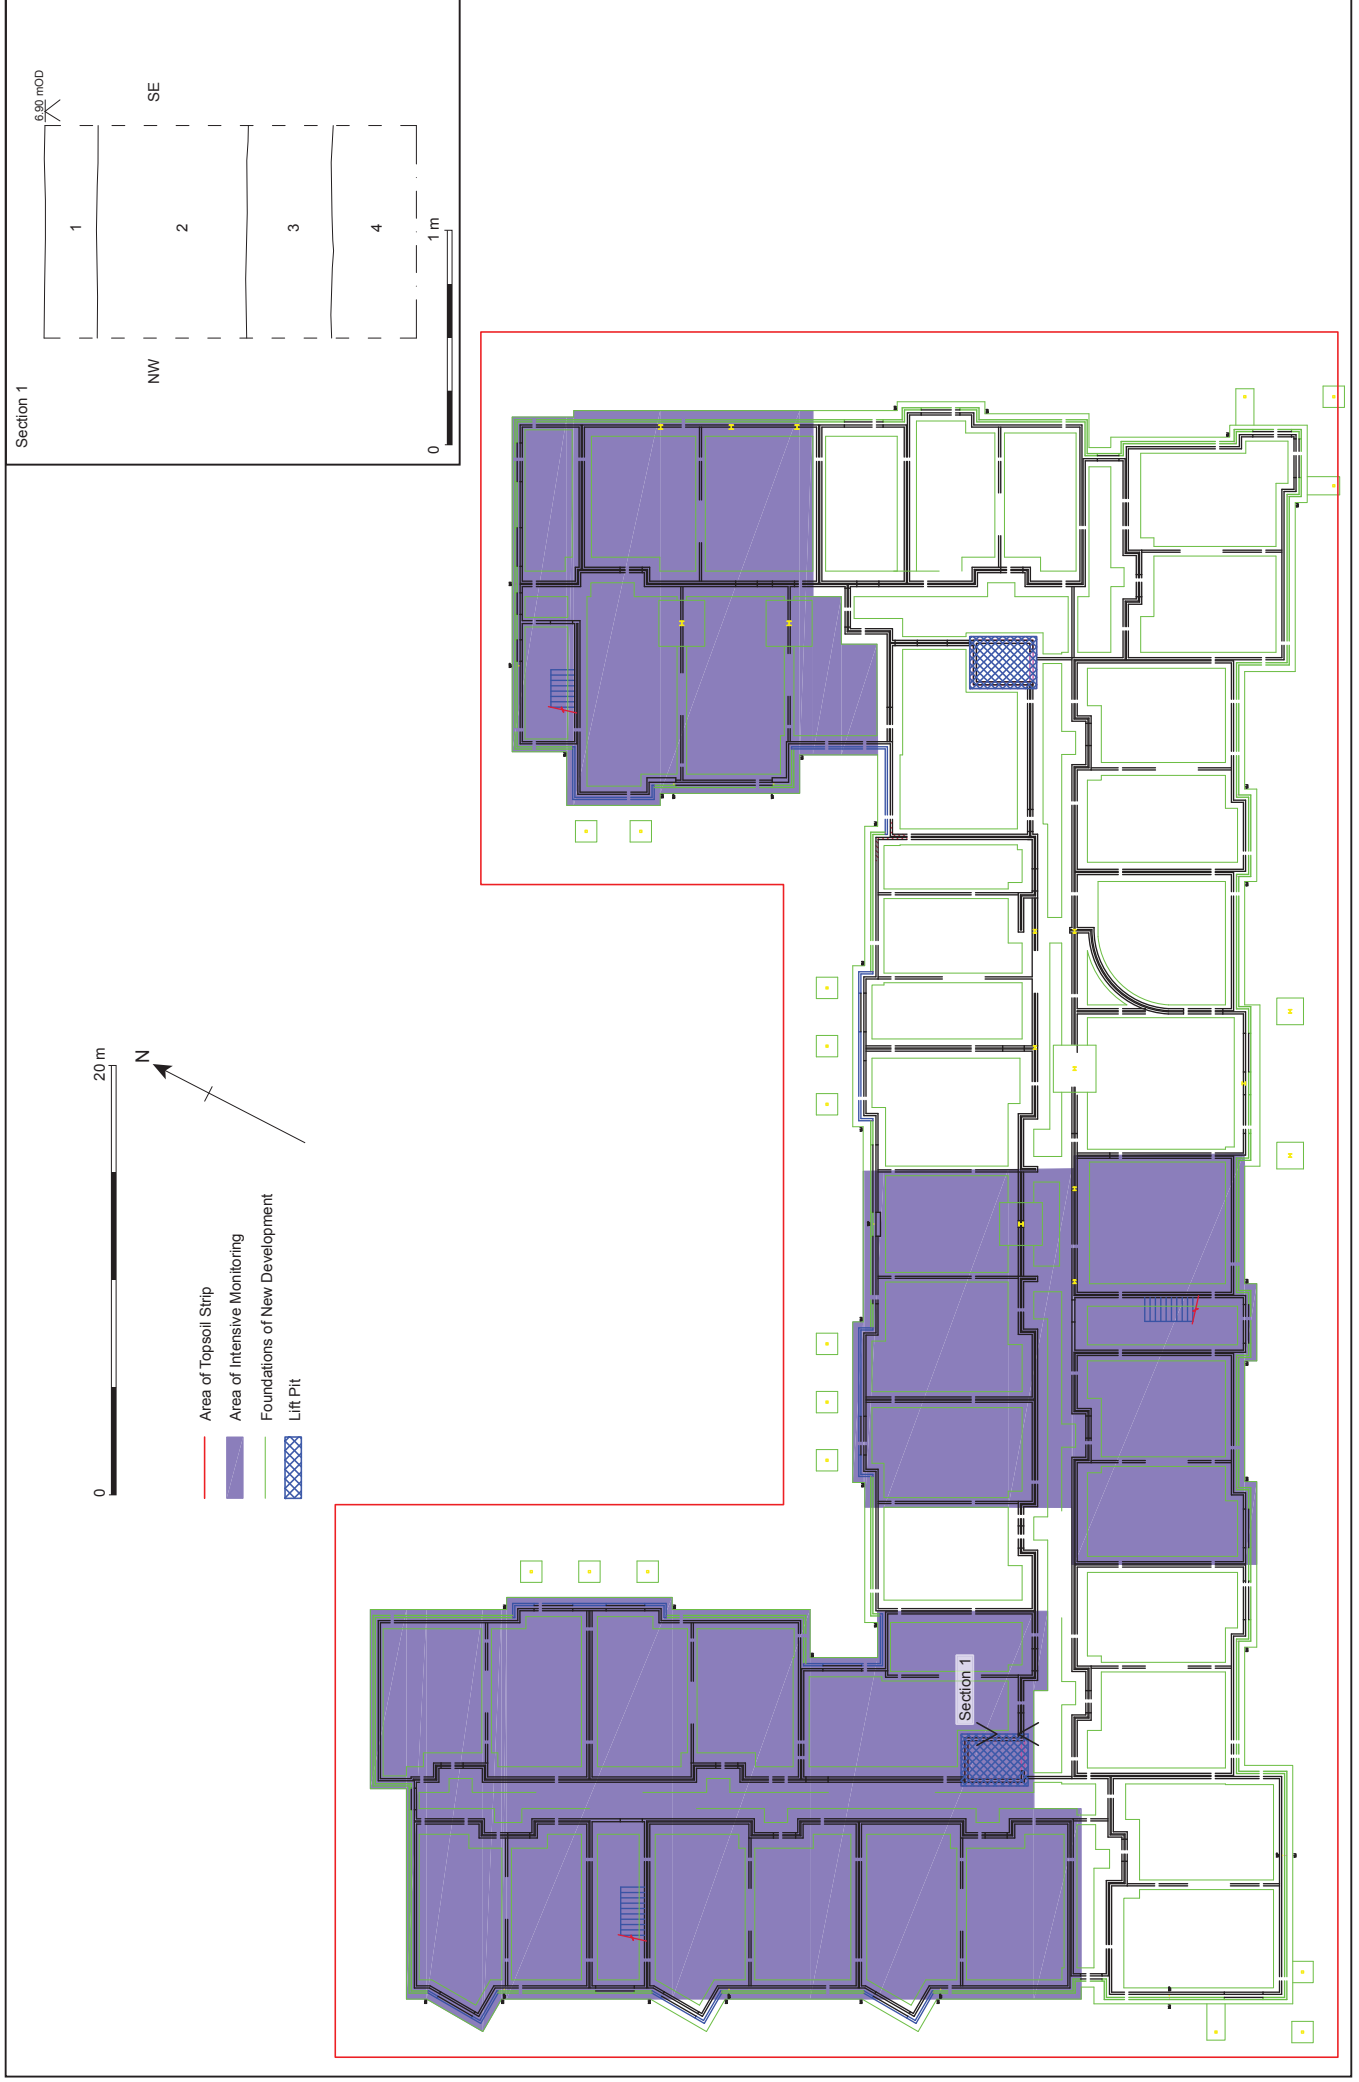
Plan of Area of Topsoil Strip and Foundation Trenches and Section
